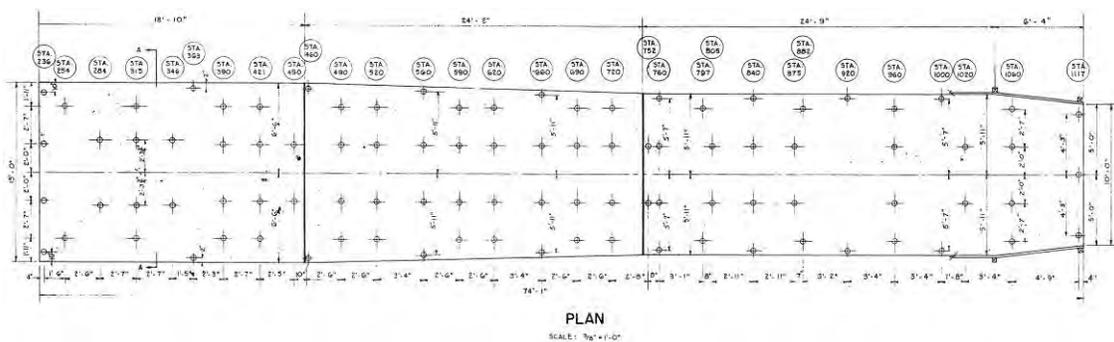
C-124 concrete mock-up for air movement training plan, 1951 (standard drawing 2-13-60 sheet 1; C-124 mock-up for air movement training, concrete plan, sections, and details; 7 December 1951). (NARA College Park, RG 111-SC WWII, box 241, photo SC413207).
